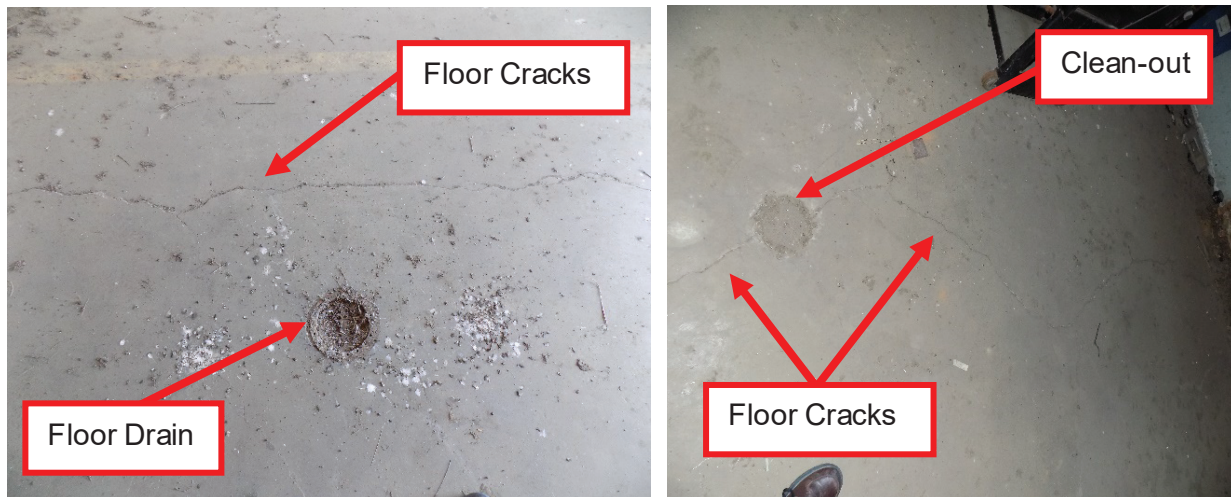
Building 483-3D, Floor Cracks In Proximity To Clean-out And Floor Drains
